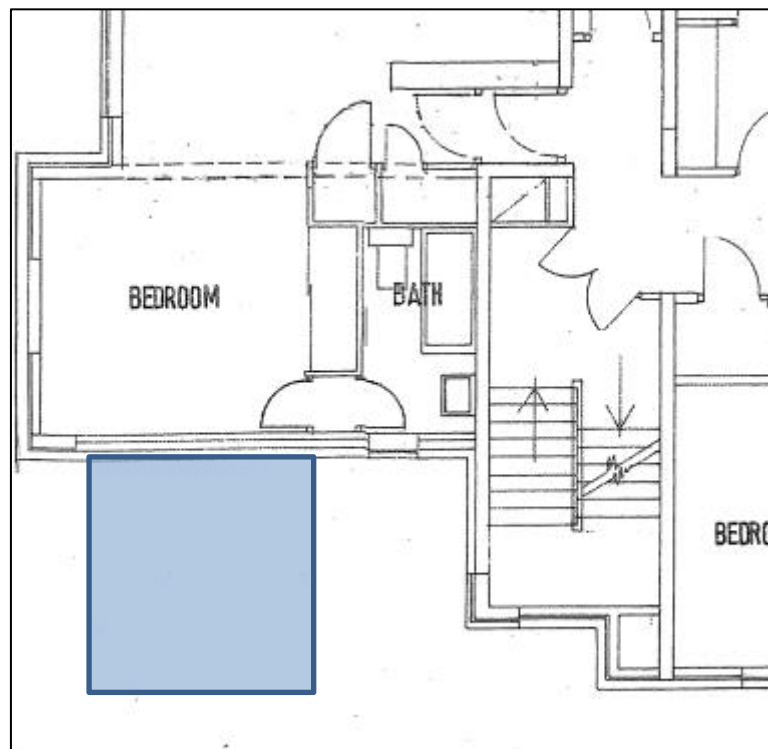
Illustration of approximate lift shaft position relative to existing dwelling
